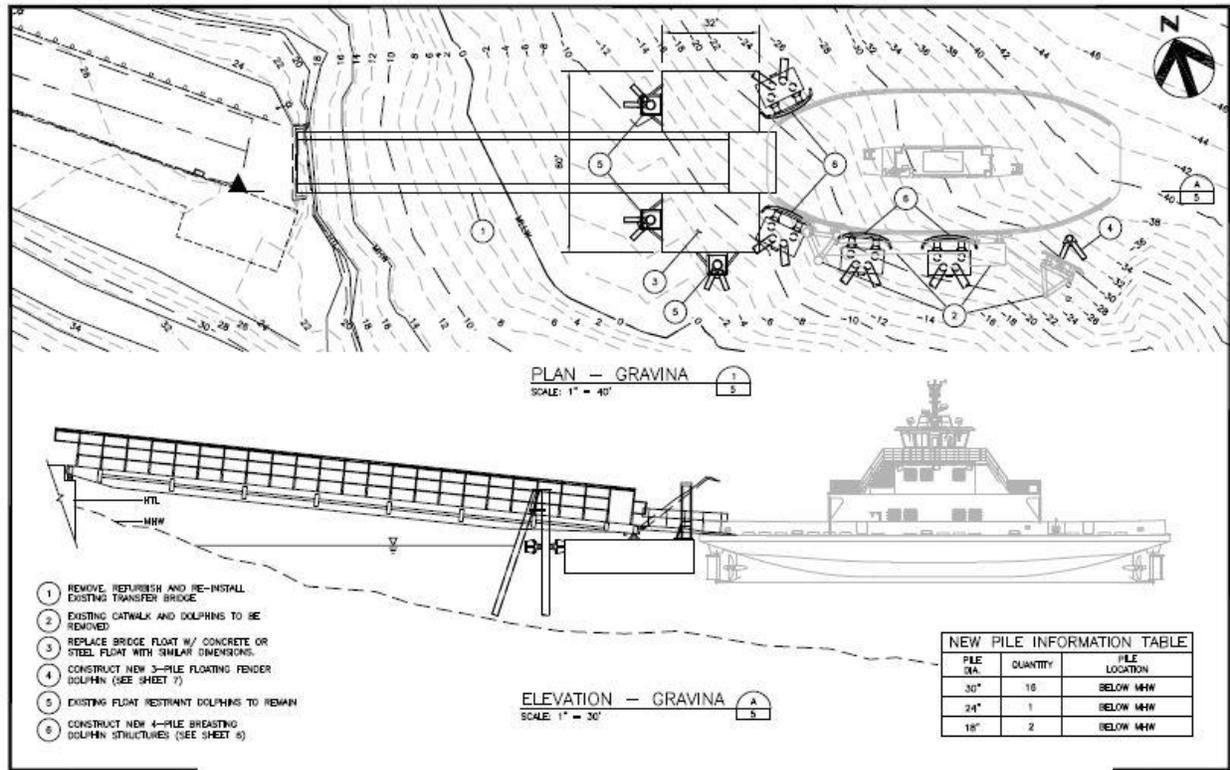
Plan drawing for refurbishment of the existing Gravina Island Ferry Berth (HDR 2023).
